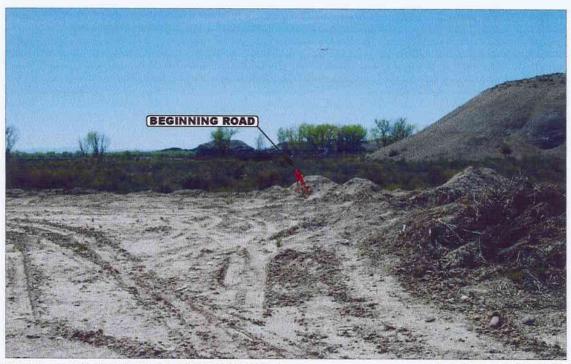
PHOTO: VIEW FROM BEGINNING OF PROPOSED ROAD
